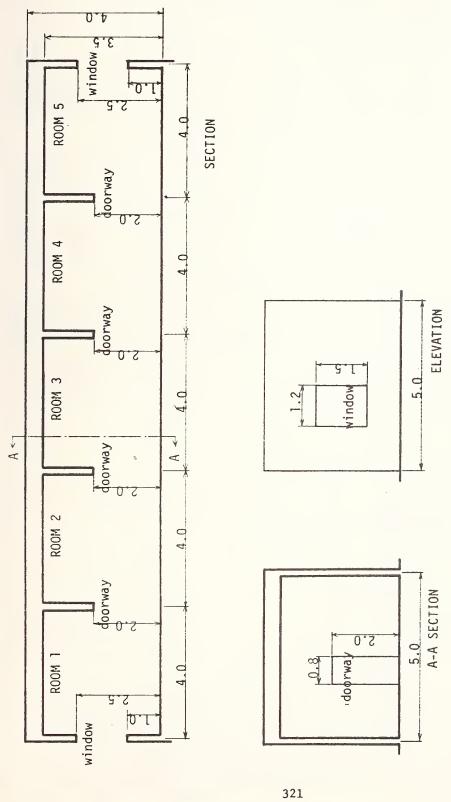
Dimensions of 1-Floor Building (unit:m)
